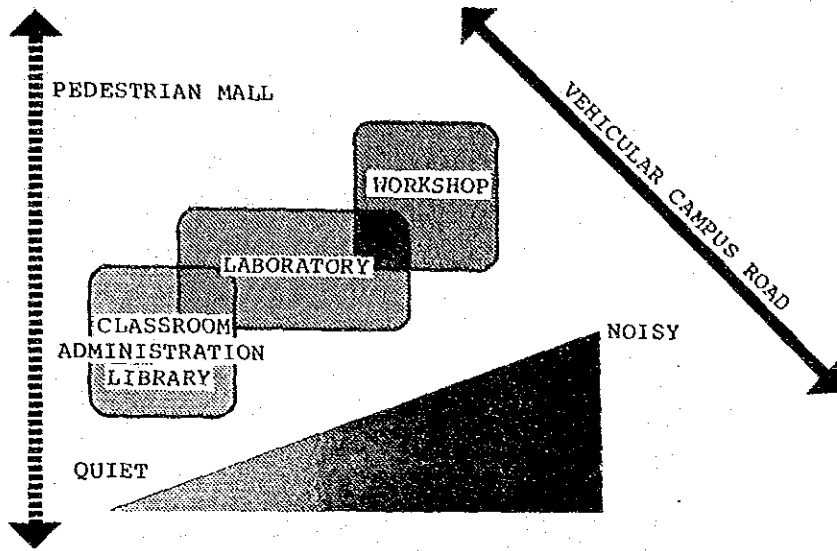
Facilities Layout Concept of Sukolilo Campus Master Plan
